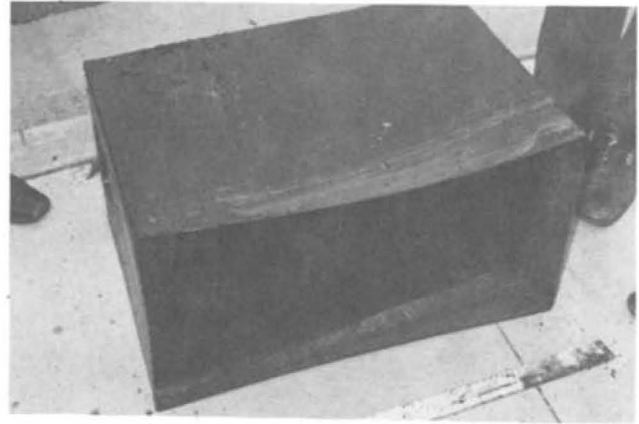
Use of liner in underground vault to provide air trap to protect distribution equipment from water.
